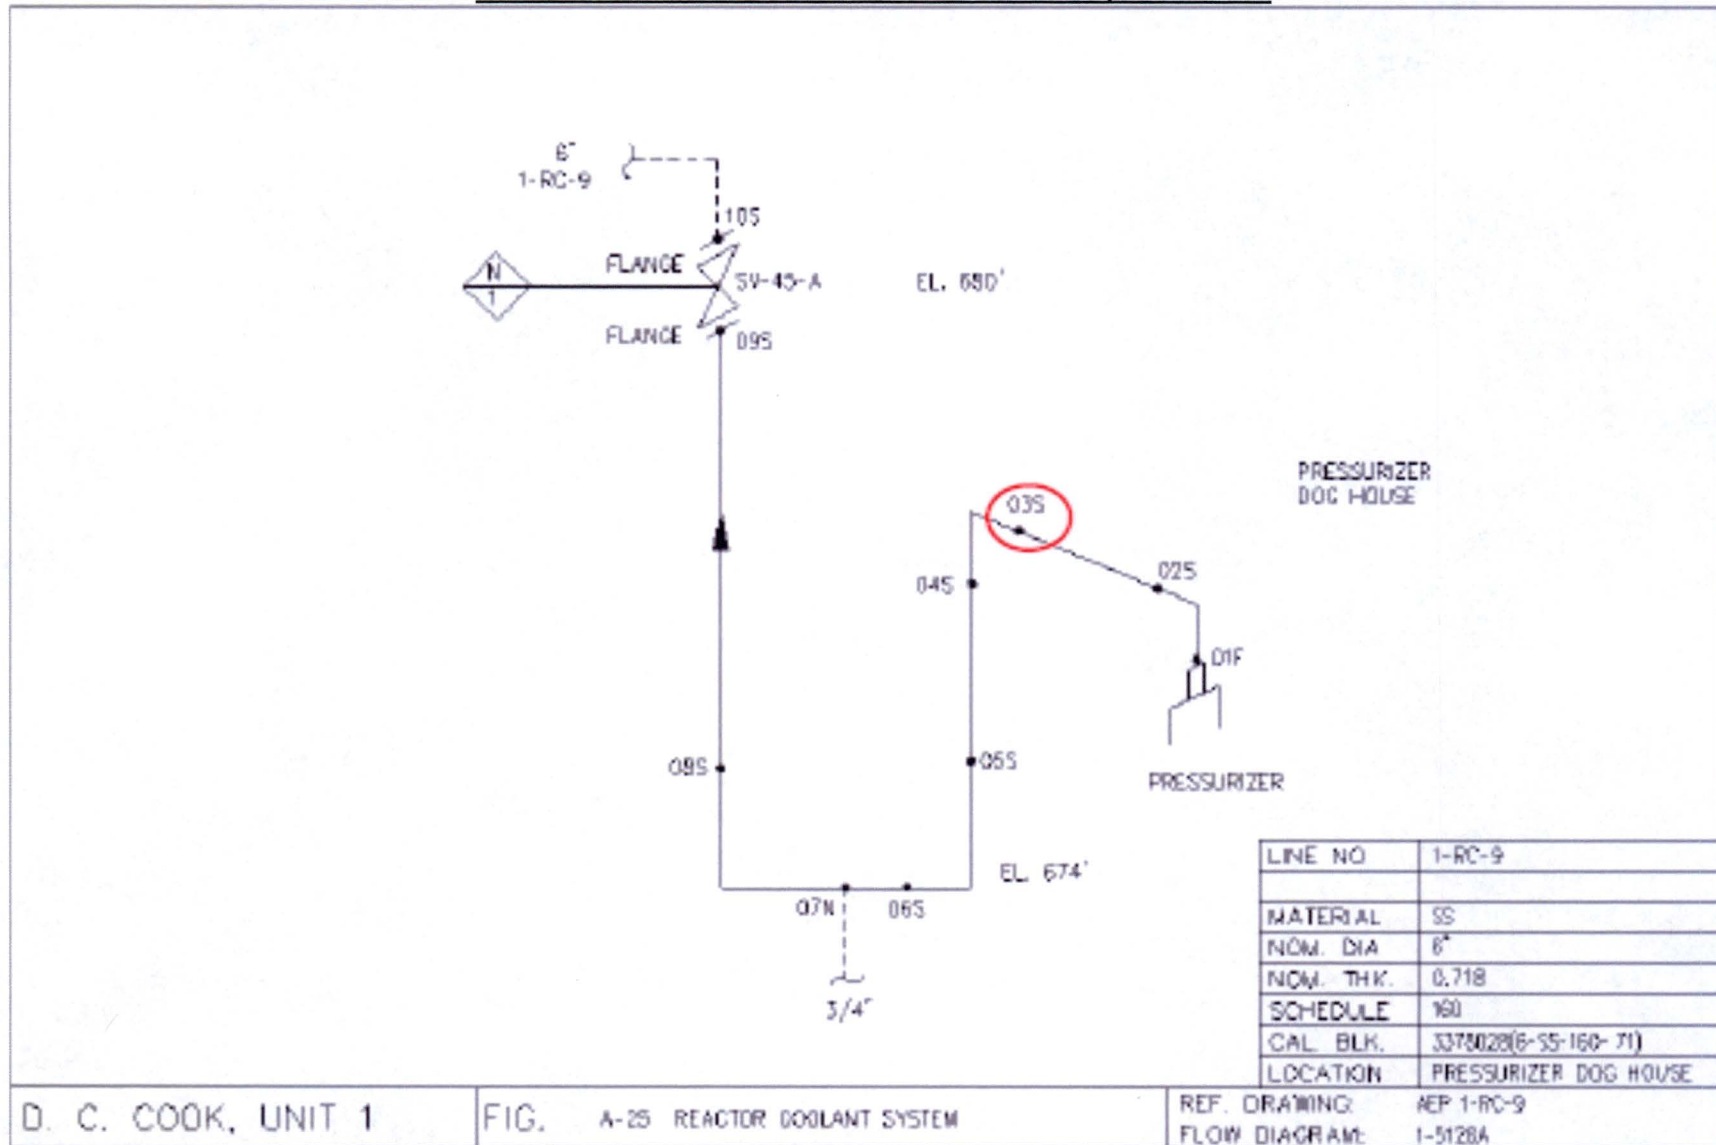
Weld 1-RC-9-03S (Extracted from Reference DRAWING A-25)
